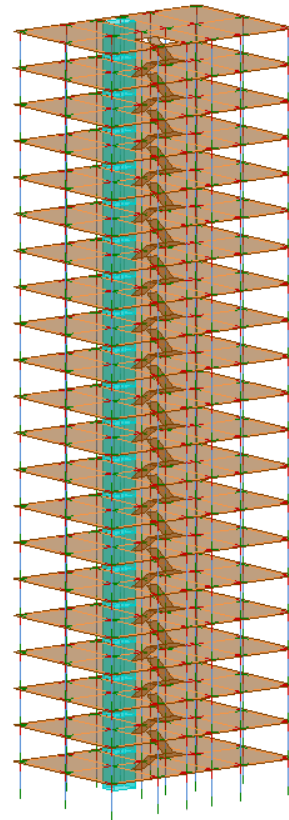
Elevation (3D View) With-Out Shear Wall At Revit Software
